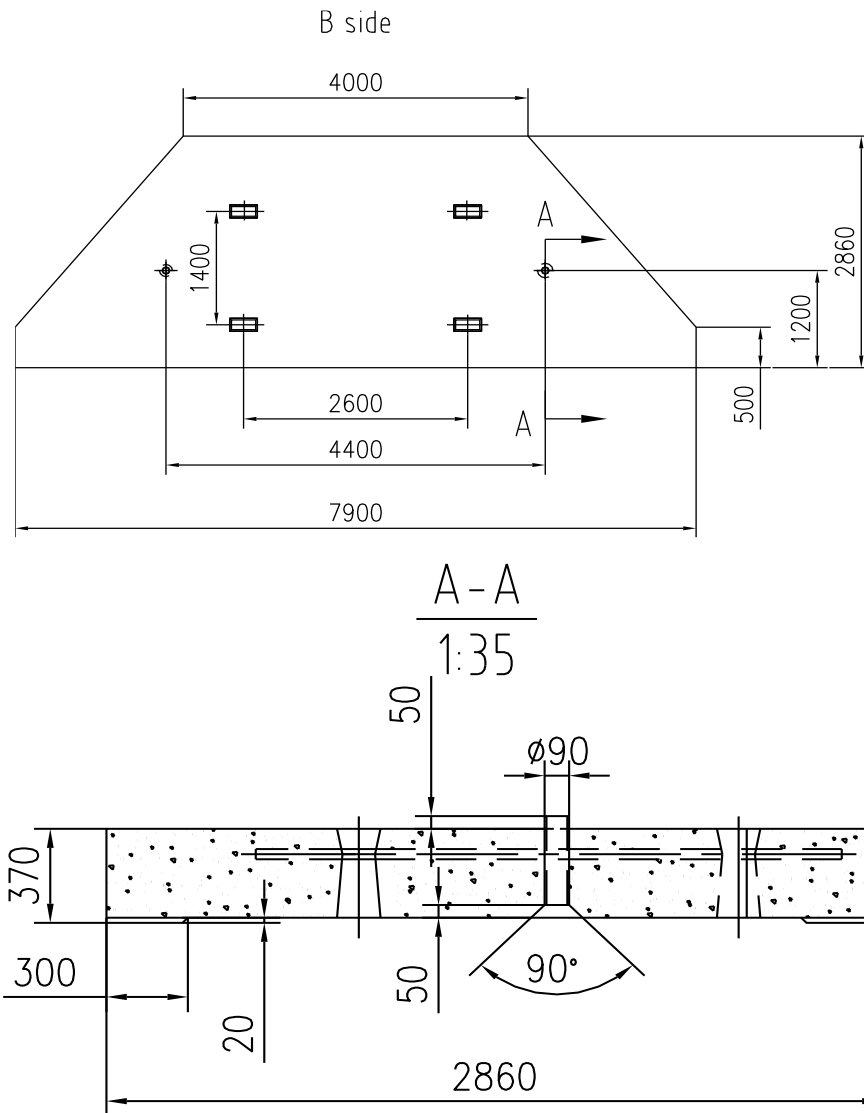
Assembly drawing of D1100-YZ (000201199A0020000)
